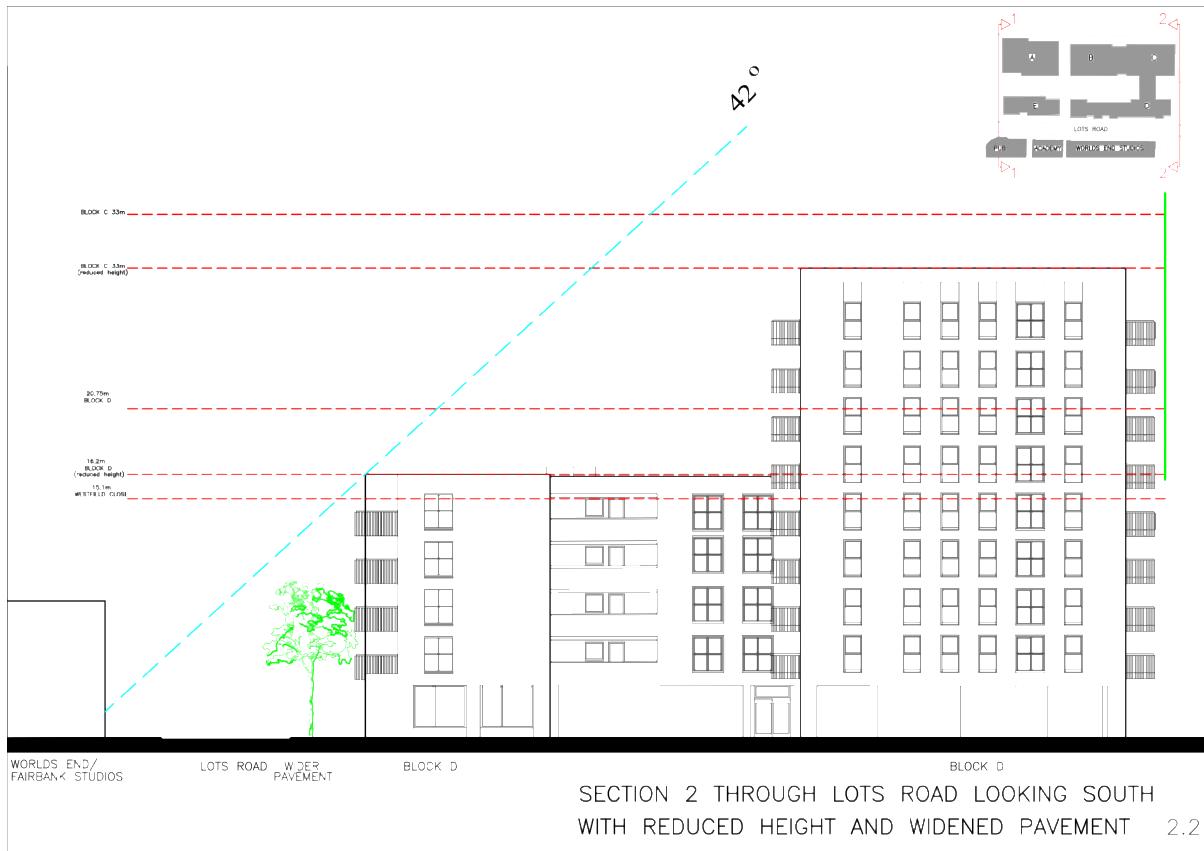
Illustration of LRNF proposal to widen the pavement in front of Block D
